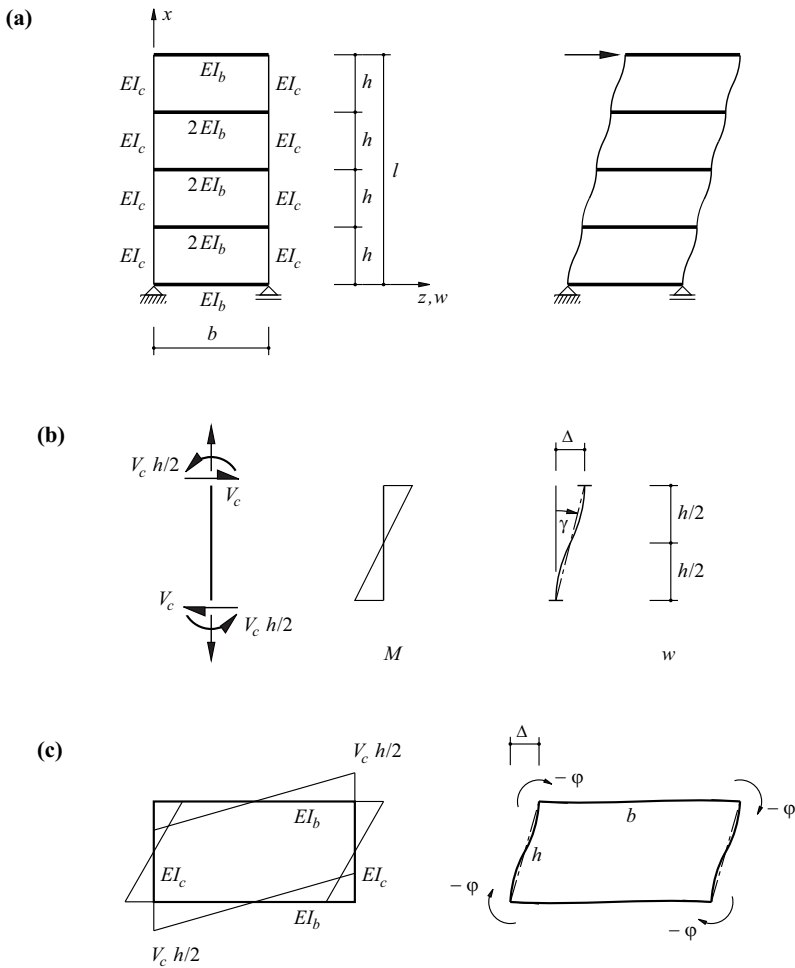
Multi-storey frame: (a) notation and deformations, (b) single column, (c) frame element
